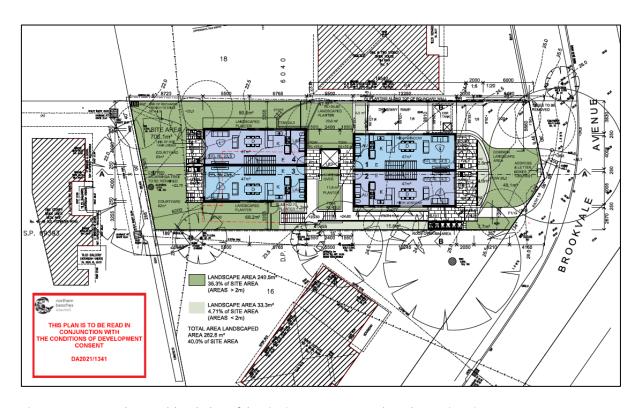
Approved ground-level plan of the site (Source: Barry Rush and Associates)
